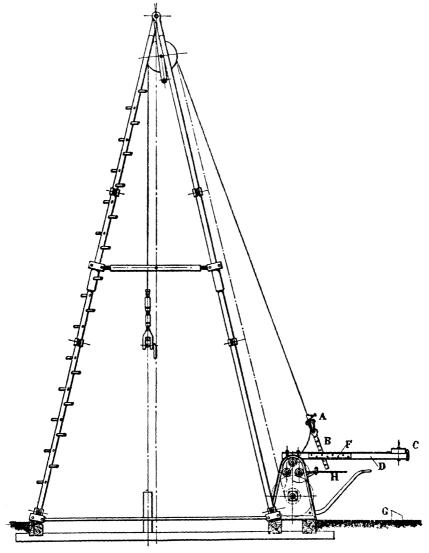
Derrick manufactured by Werf Conrad, Haarlem, Holland. For rotary, percussion, or free-ball system of boring. This apparatus will handle heavy drills. It is too heavy for general bored-latrine work.
